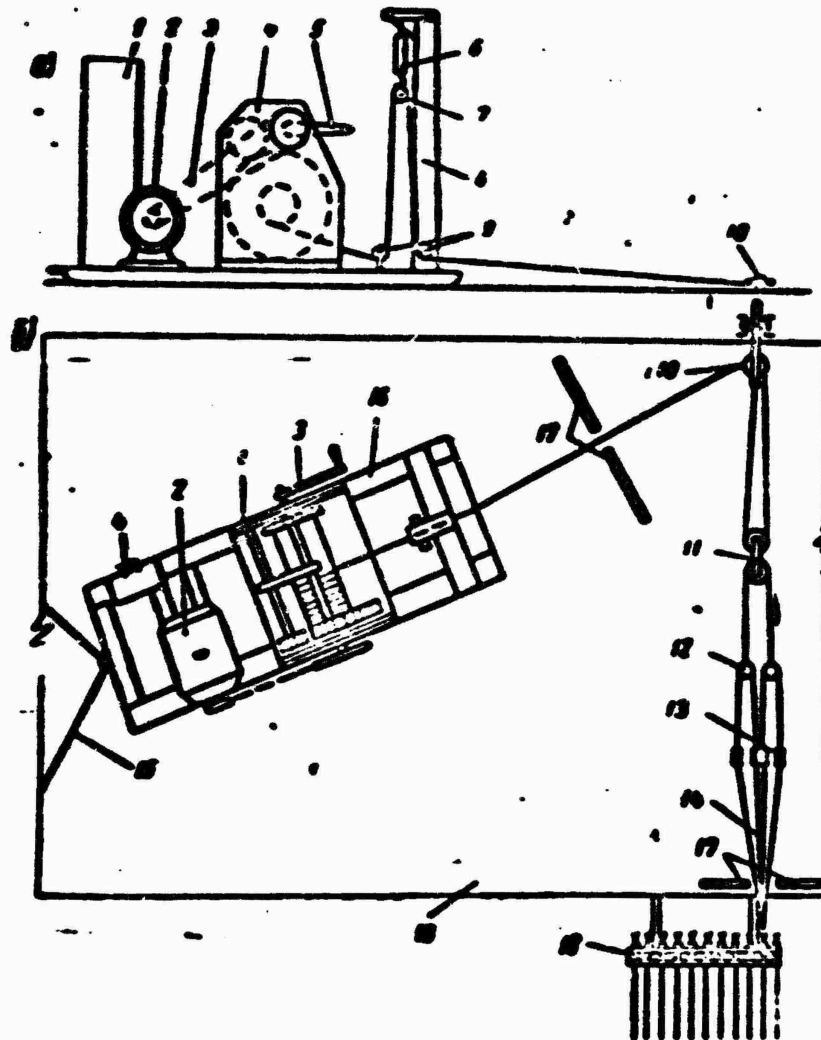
Scheme for pretensioning of wires by a driven winch. a) Is the general view; b) is the tensioning arrangement. 1) Switch; 2) electric motor; 3) chain drive; 4) single drum winch; 5) removable winch handle; 6) dynamometer; 7) upper pulley; 8) support; 9) guiding pulleys; 10) rotating pulley; 11) frame with pulleys; 12) balancing pulleys; 13) holding devices; 14) wire being tensioned; 15) fastening cable; 16) frame; 17) fencing; 18) immovable anchor beam; 19) anchor slab.
